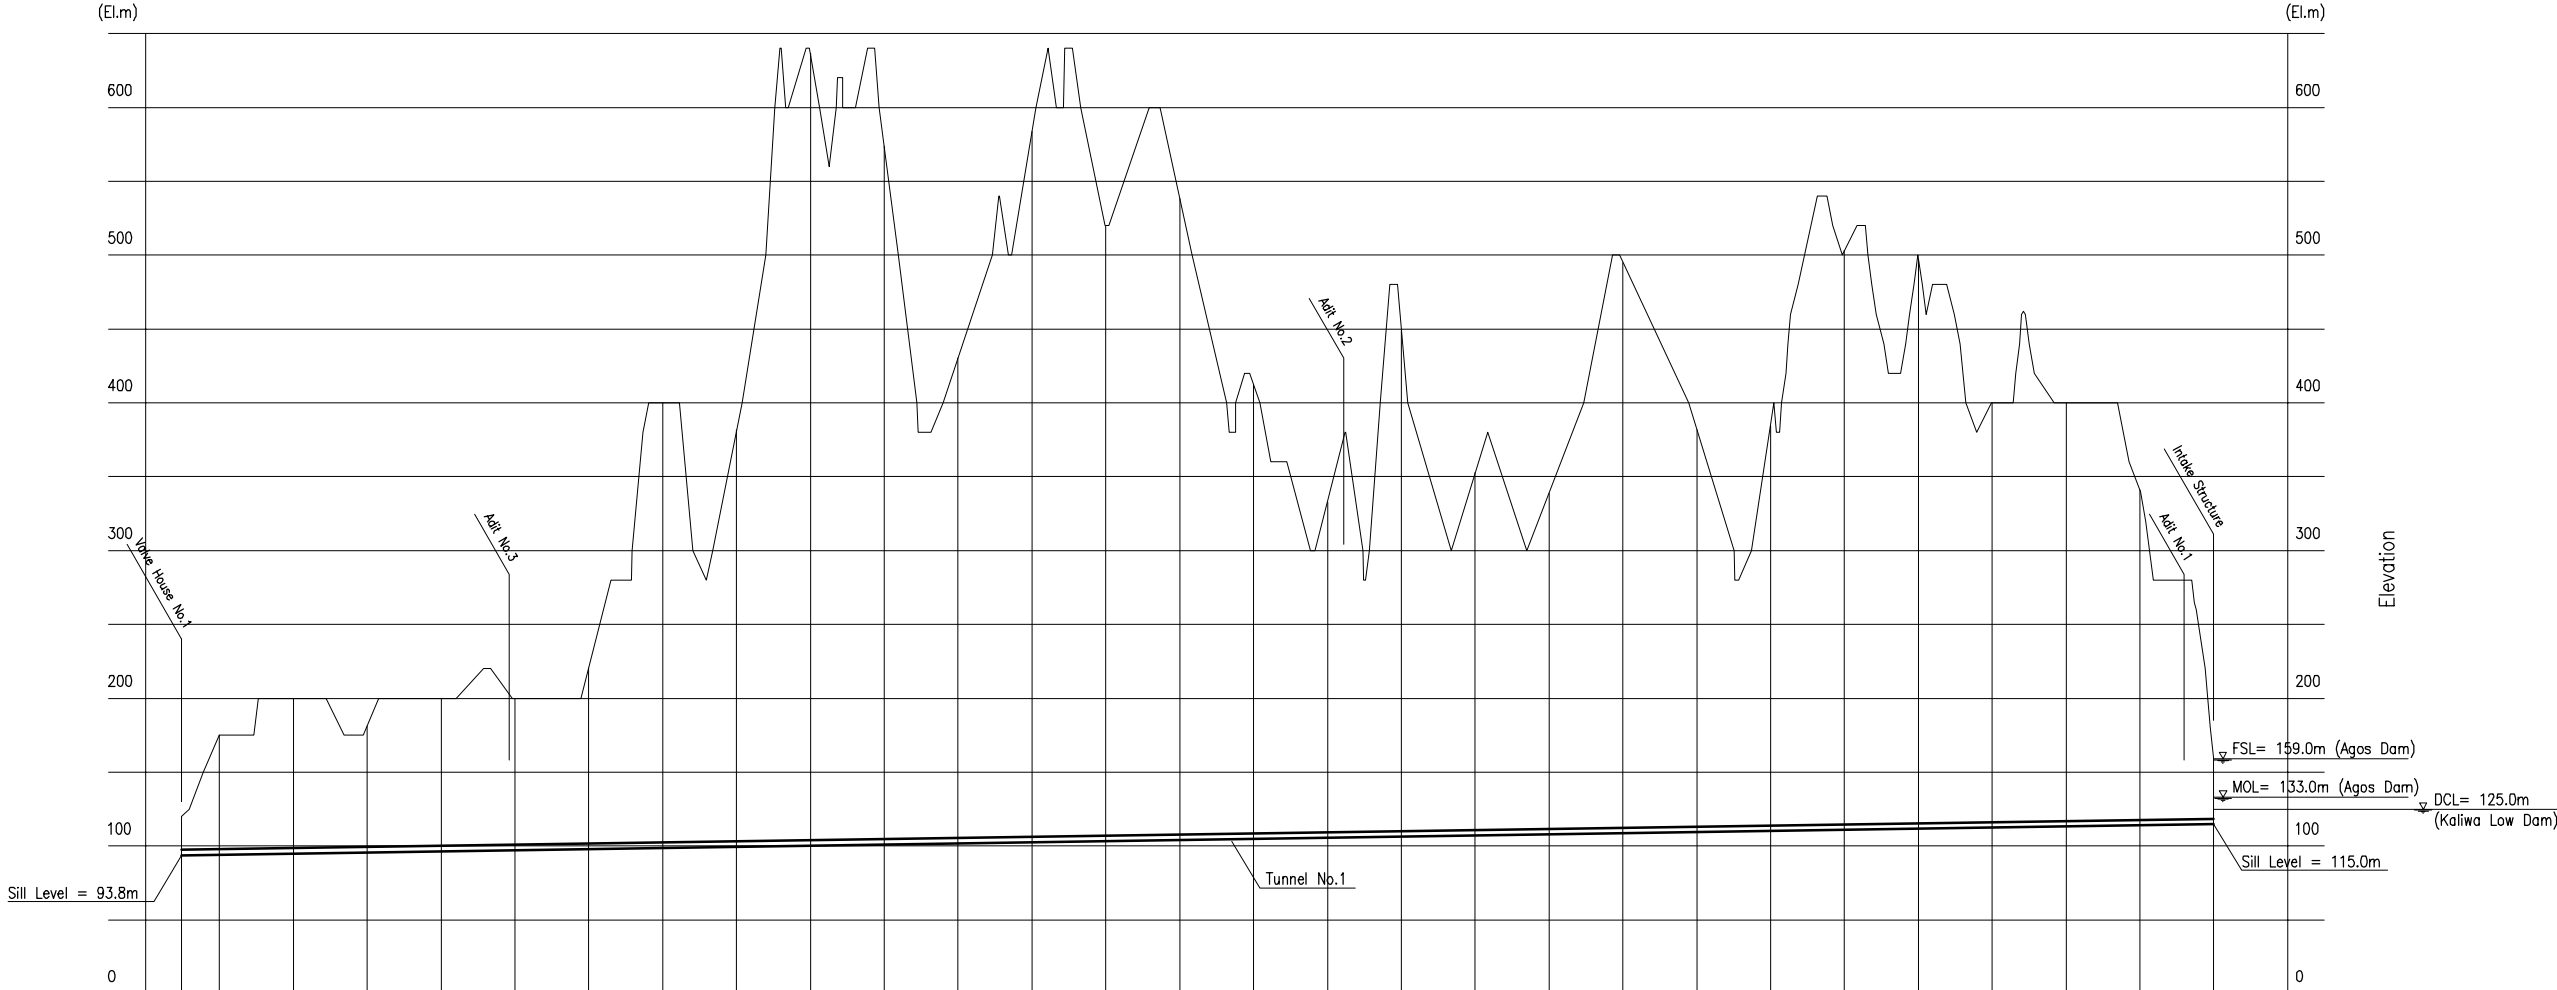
Plan Profile and Typical Cross Section of Kaliwa Low Dam
